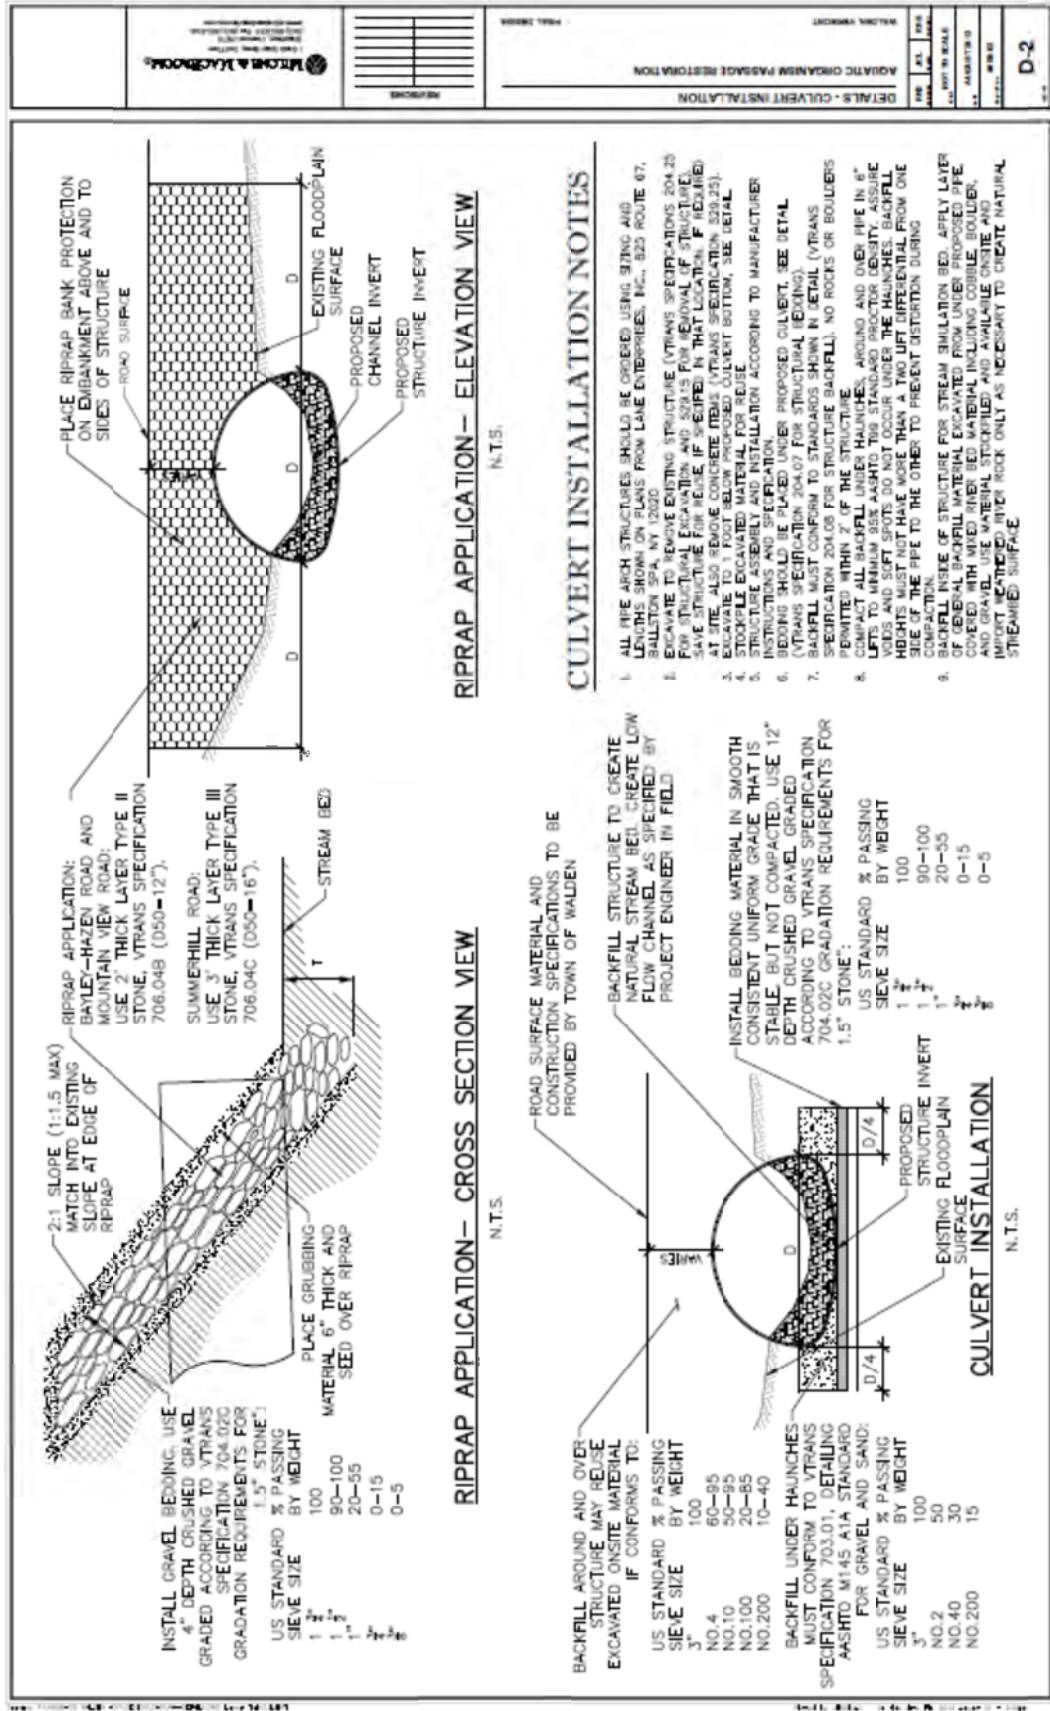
Culvert installation. (Source: Milone & MacBroom, Inc., 2013)
